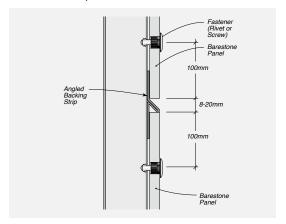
Horizontal Joint Detail with Angled Backing Strip – Rivet Fix
